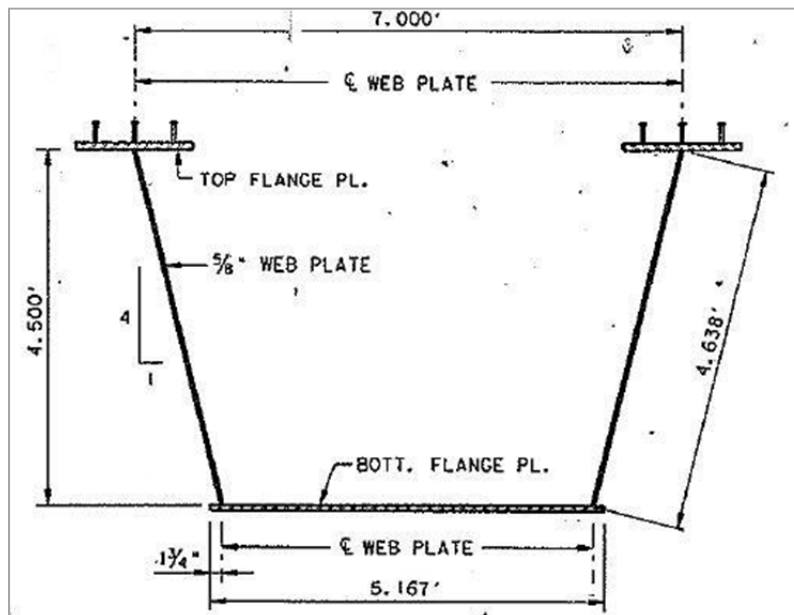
Typical cross-section of the steel girder of spans 17 and 18 of the Woodway Bridge
